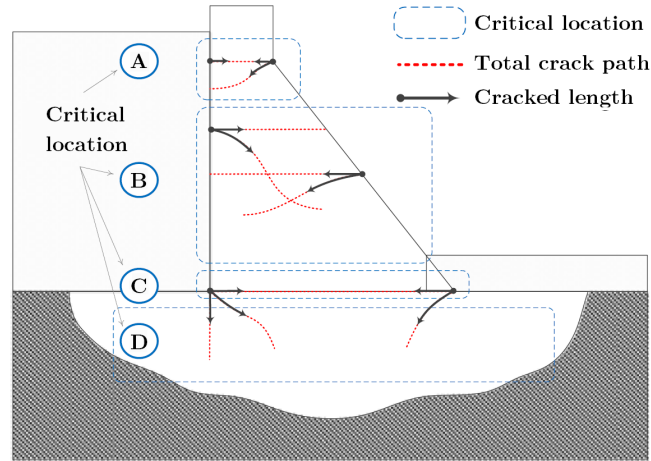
Potential failure modes of a typical concrete gravity dam, critical location and crack paths, adapted from Léger (2007).
